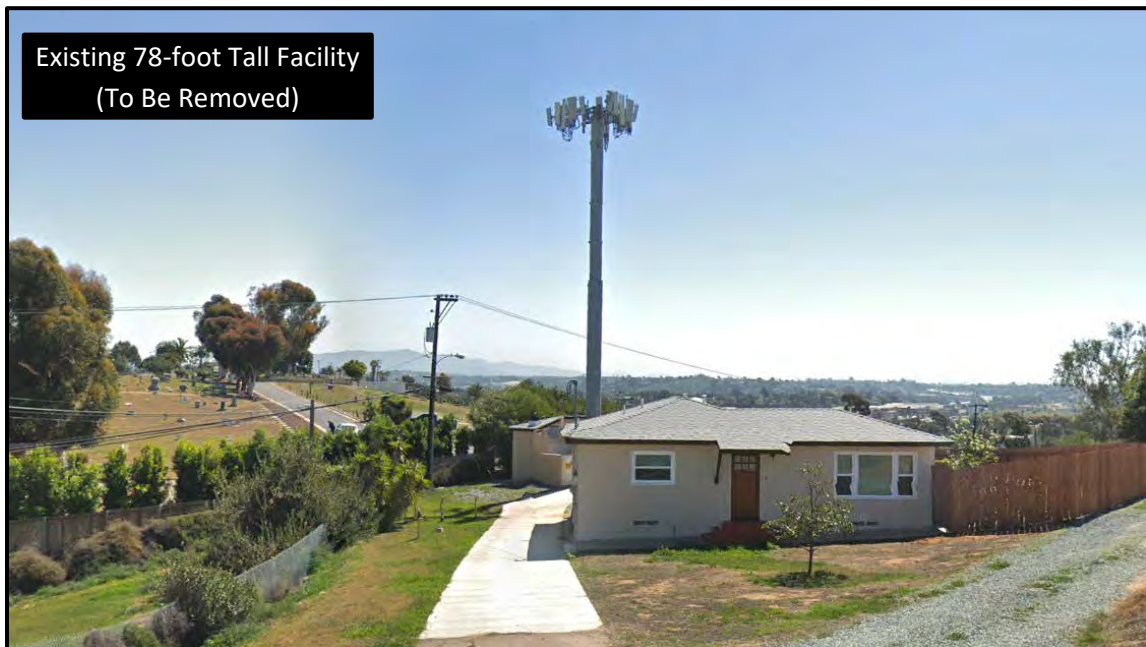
Existing off-site 78-foot tall monopole looking toward project site from Shelby Drive.
